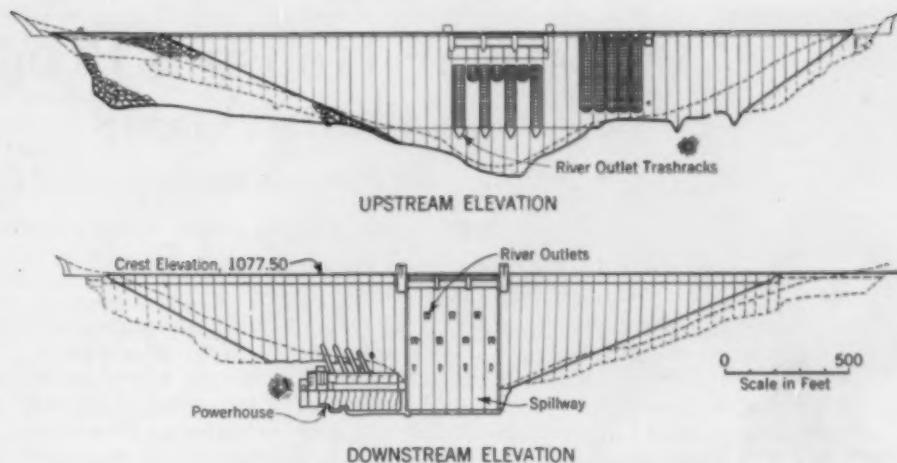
UPSTREAM AND DOWNSTREAM ELEVATIONS OF DAM
